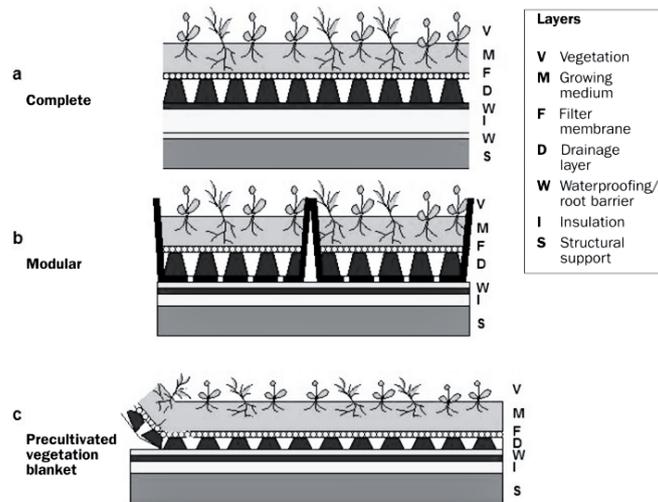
Types of extensive green-roofing technology. (a) Complete systems form integral part of the roof, (b) Modular systems are installed above the existing roof system, (c) Precultivated vegetation blankets are rolled onto the existing roof (Oberndorfer et al., 2007)
